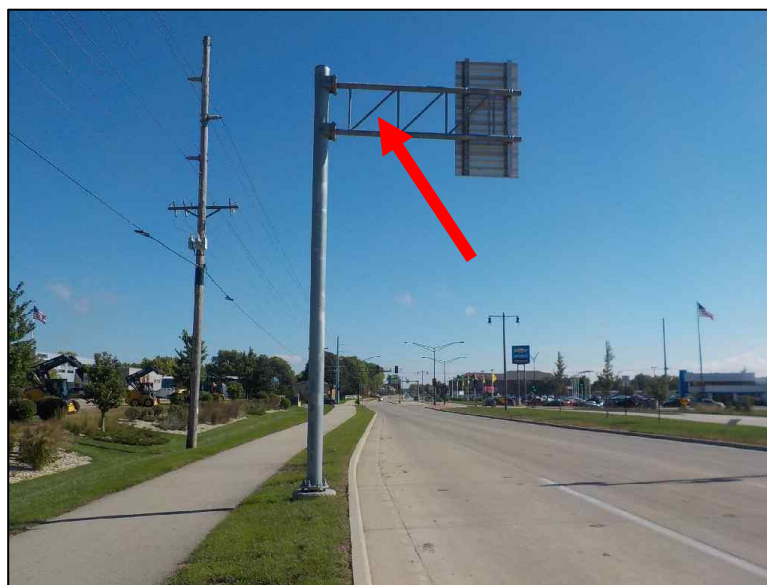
Truss installed upside down. Diagonals of Cantilever Should Angle Down Towards Sign Panel.
